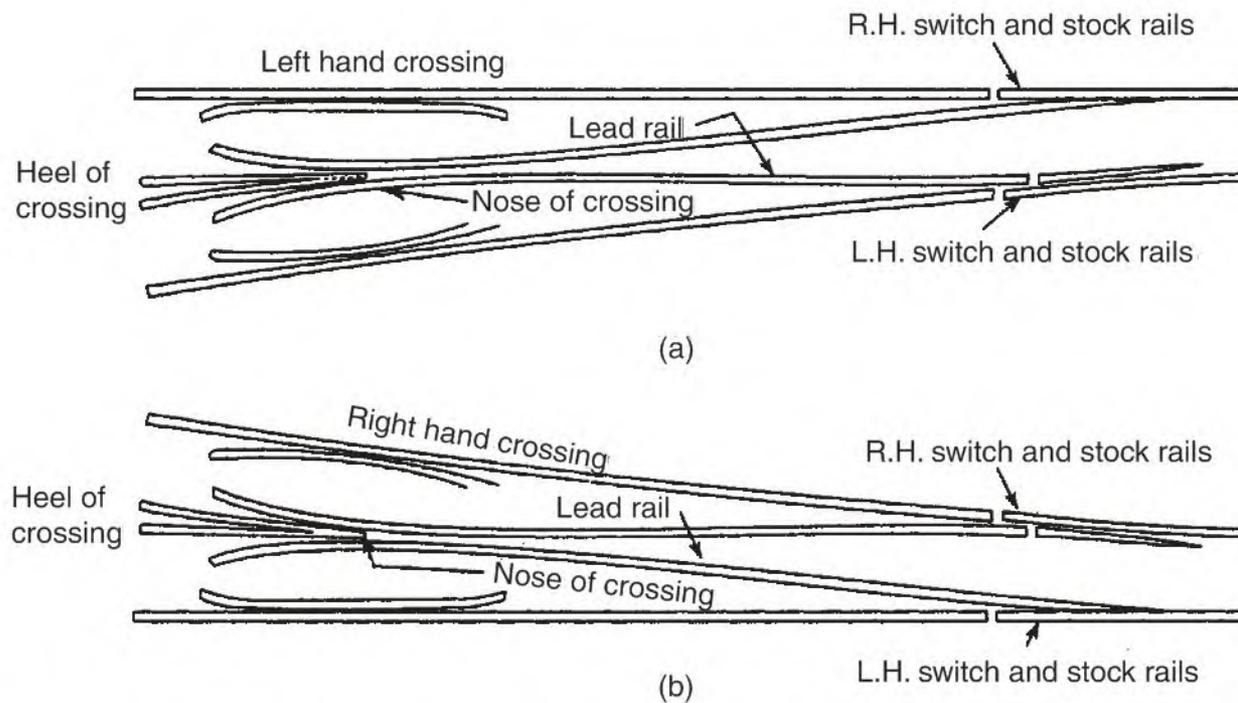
Turnouts-crossings and switches: (a) left hand; (b) right hand
